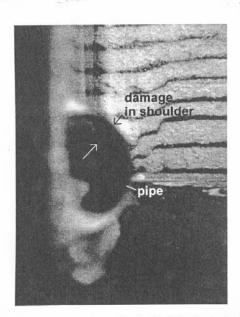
Damage experienced by the flexible pipe in the loose backfill (Section 1)
